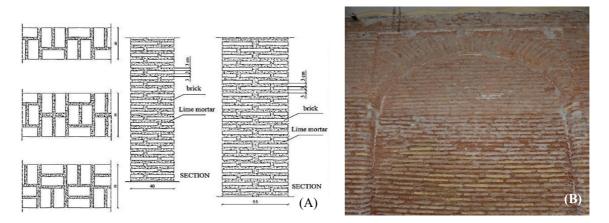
Details of Wall Construction in the Casbah of Algiers (A) [7], Wall materials (B)
